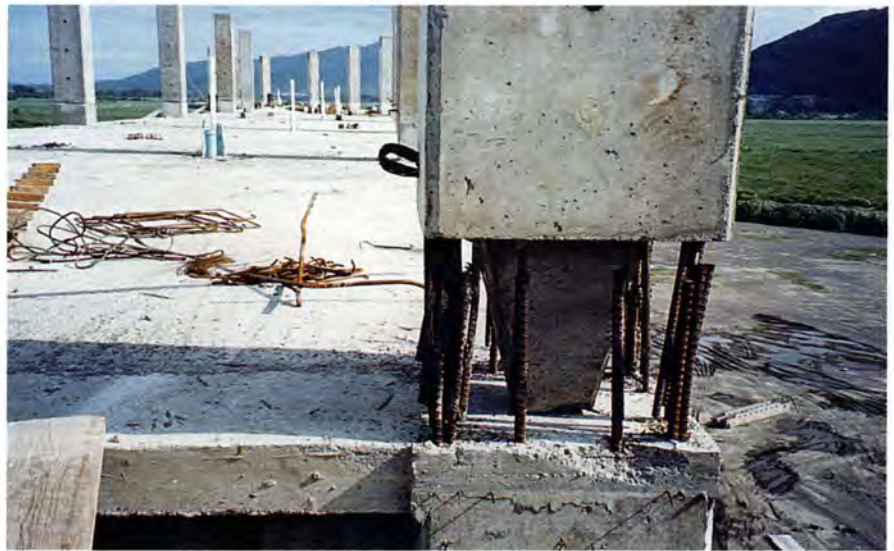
Connection at frame joints between columns using vertical reinforcement.
